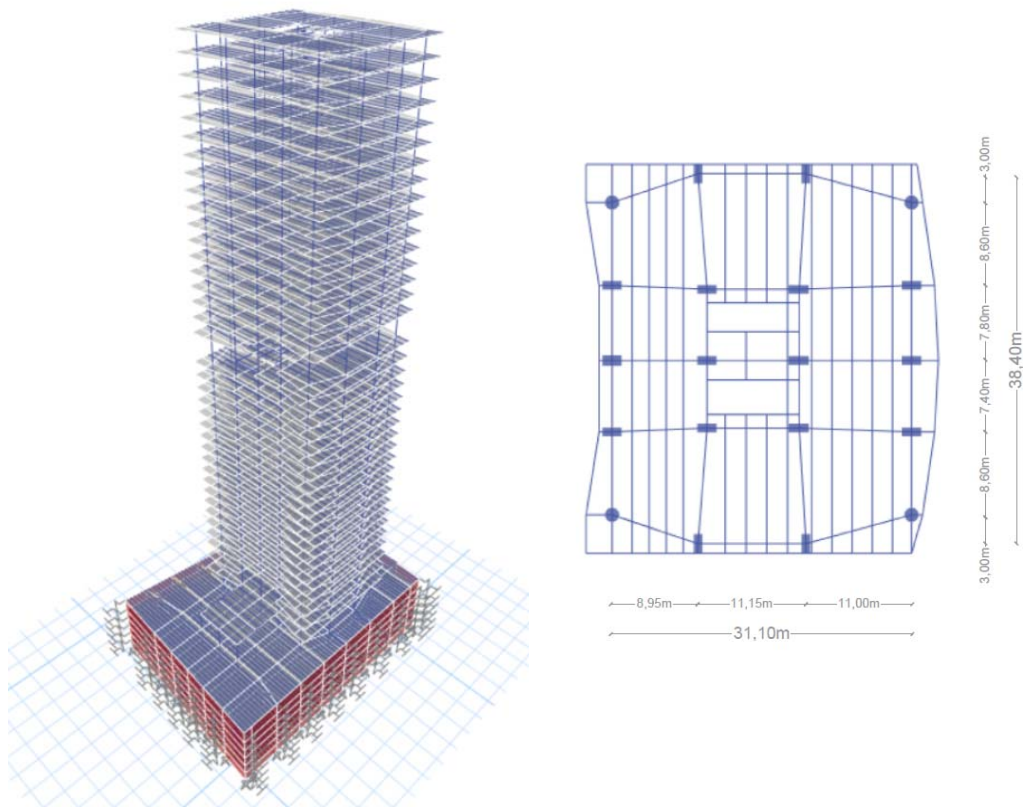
Case of study B. Isometric view of the building (left); plan view of the building (right)
